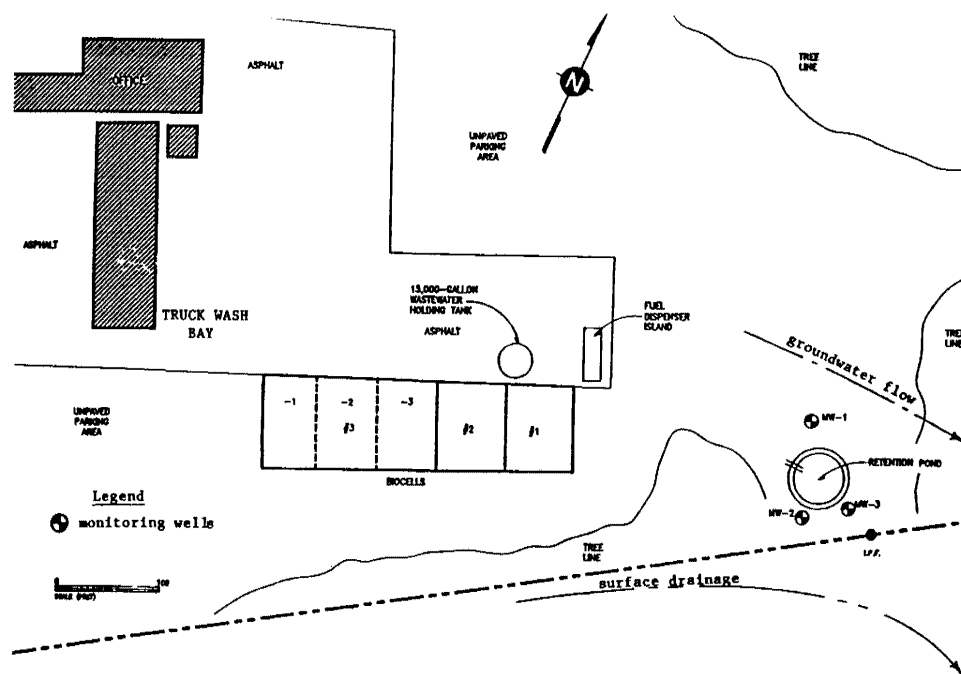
Site plan indicating major site features; including truck wash bay, fuel island, former wastewater lagoon, site hydrology, and biocell layout.
